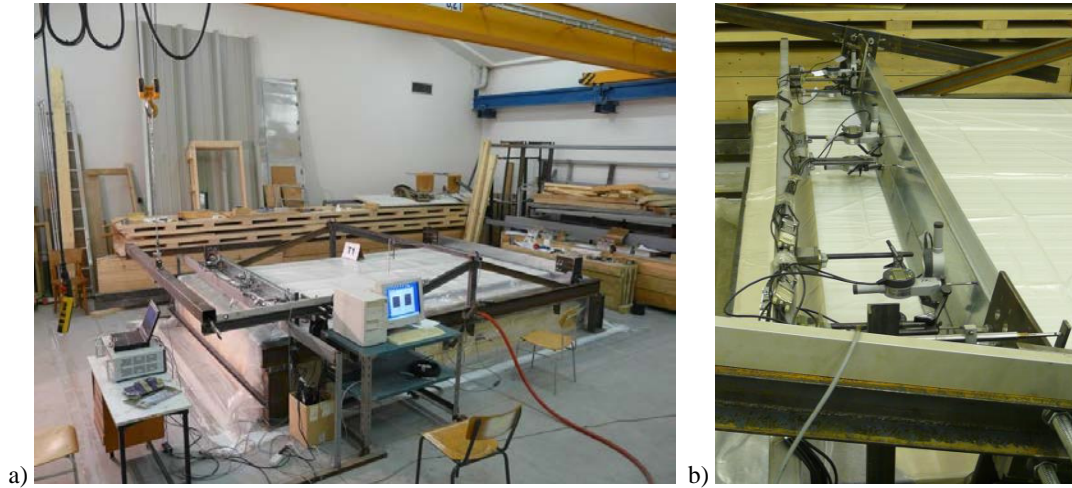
(a) Test set-up; (b) deformation of the purlin.
